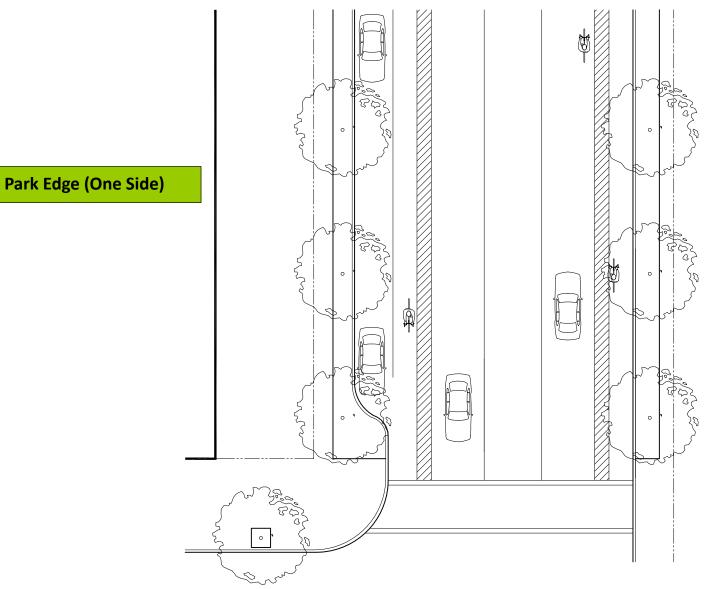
Street Type 4.1: Typical Intersection (Plan Perspective)
